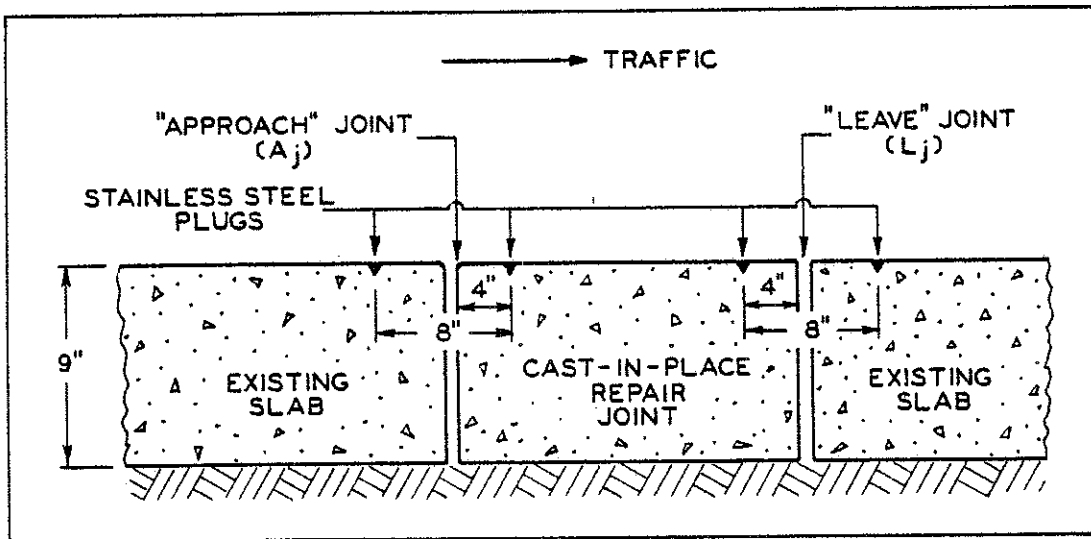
Stainless steel plugs embedded in the concrete surface as reference points to monitor joint movements at the approach (A_j) and leave (L_j) joints of each concrete patch. Both joint width and faulting measurements were made using these reference points.
